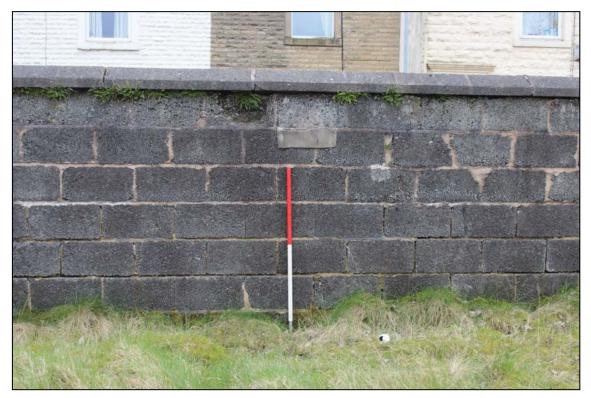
North facing elevation of early generation concrete block wall, from the north. Scale 1.0m.
